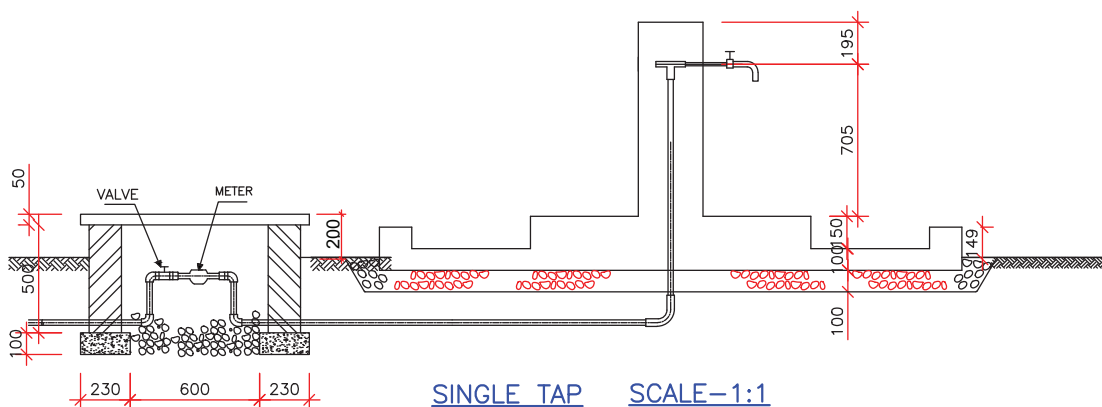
Typical Detail of a Single Tap Domestic Point
